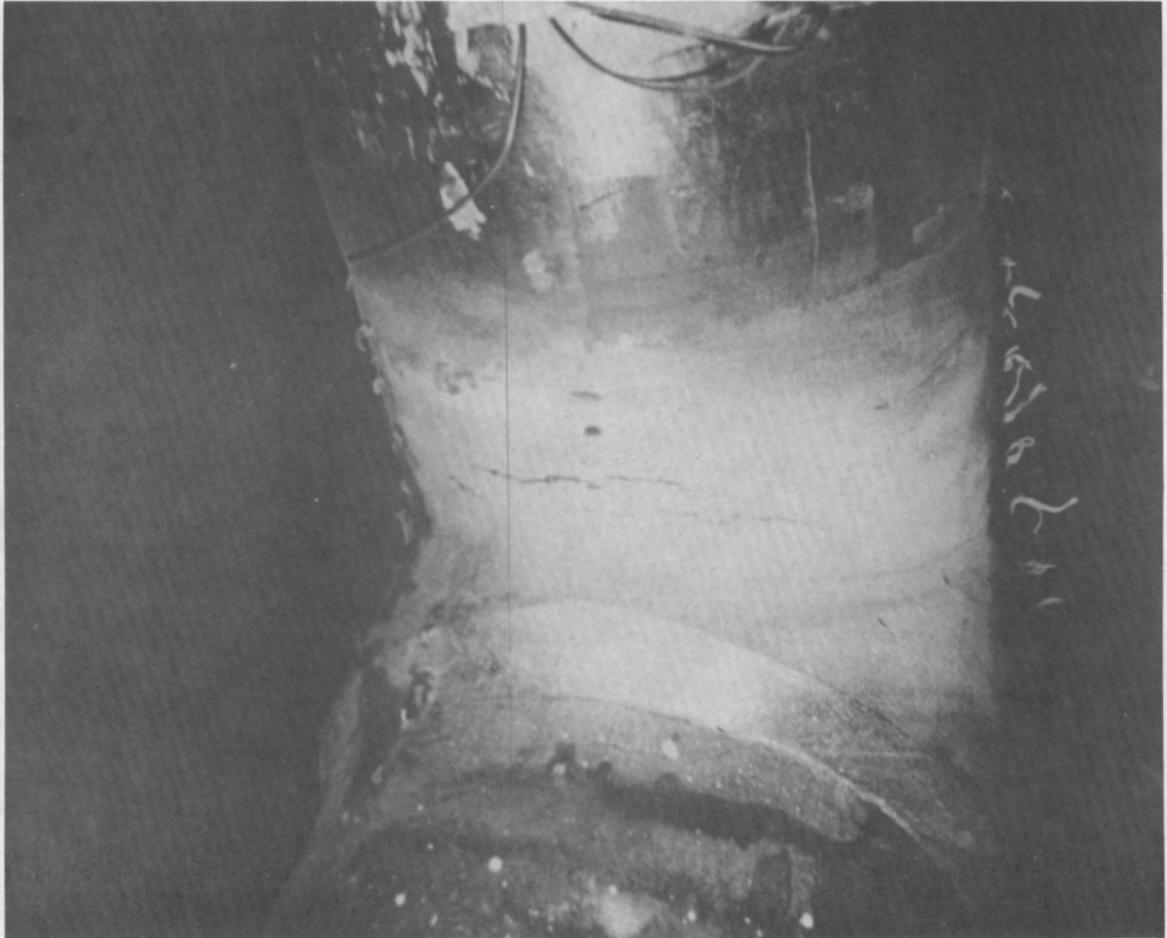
Fatigue cracks in T-7 after 8465 cycles.
